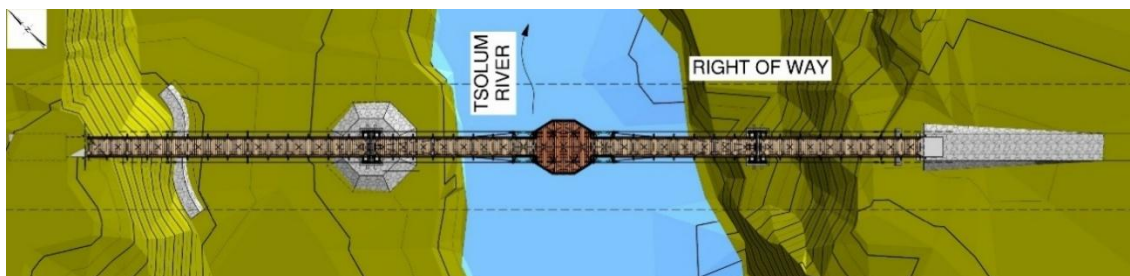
Plan view of the Tsolum River Bridge within the former Comox Logging and Railway Company right of way.
